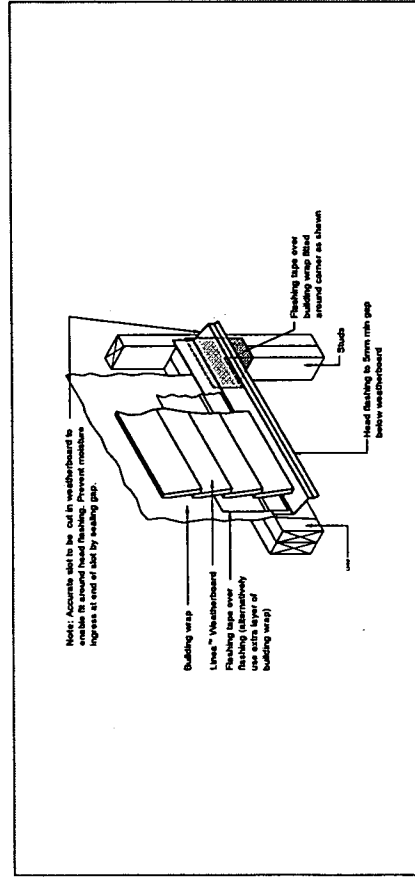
DIRECT FIX HEAD FLASHING TERMINATION
